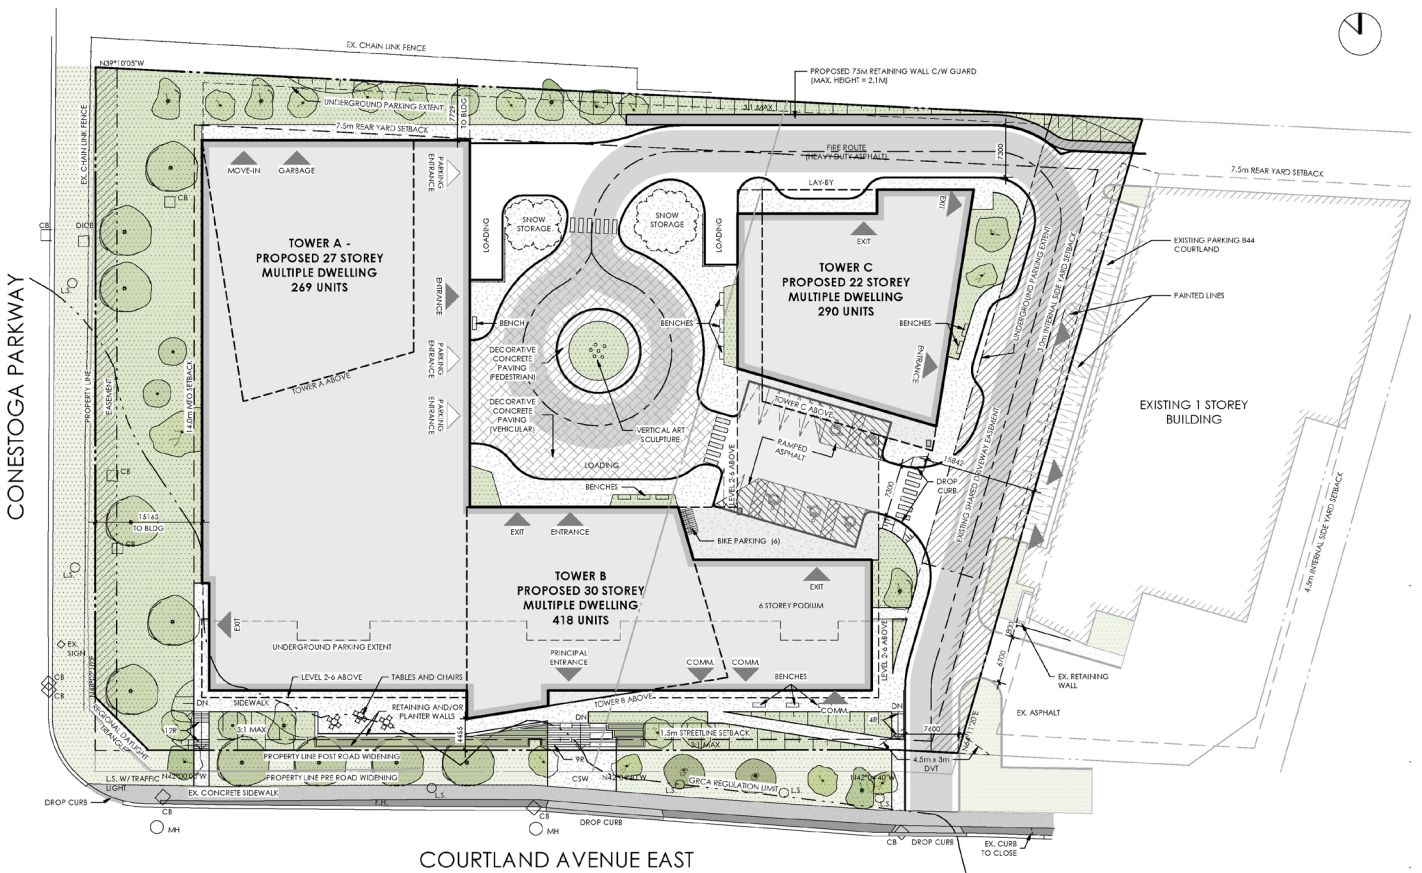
FIGURE: Proposed Development Plan for 808 & 836 Courtland Avenue East (ABA Architects)
